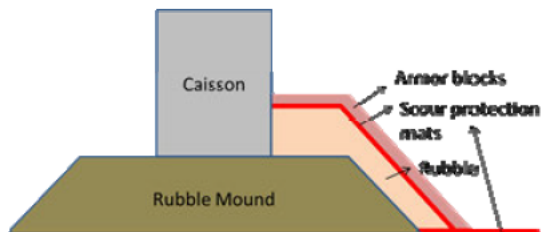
Cross section of breakwater with countermeasures against scouring due to overflow of tsunami
